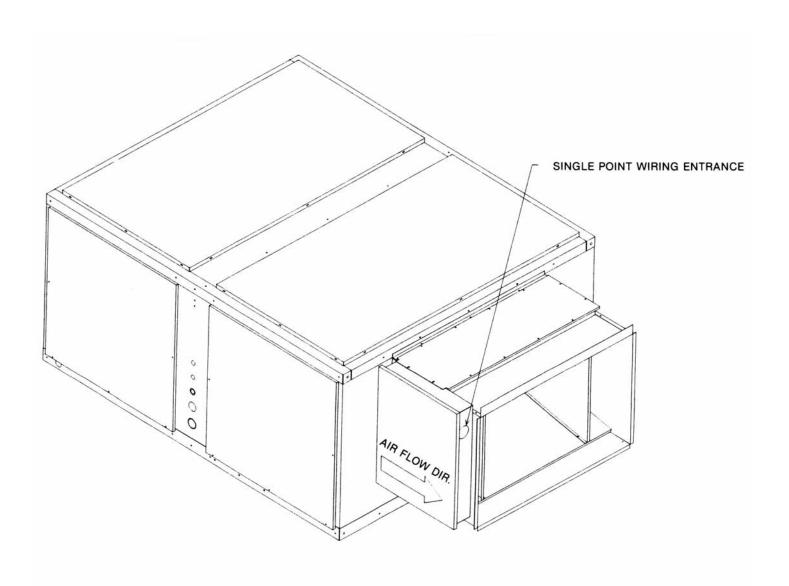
HEATER KIT INSTALLED TO AIR HANDLER
